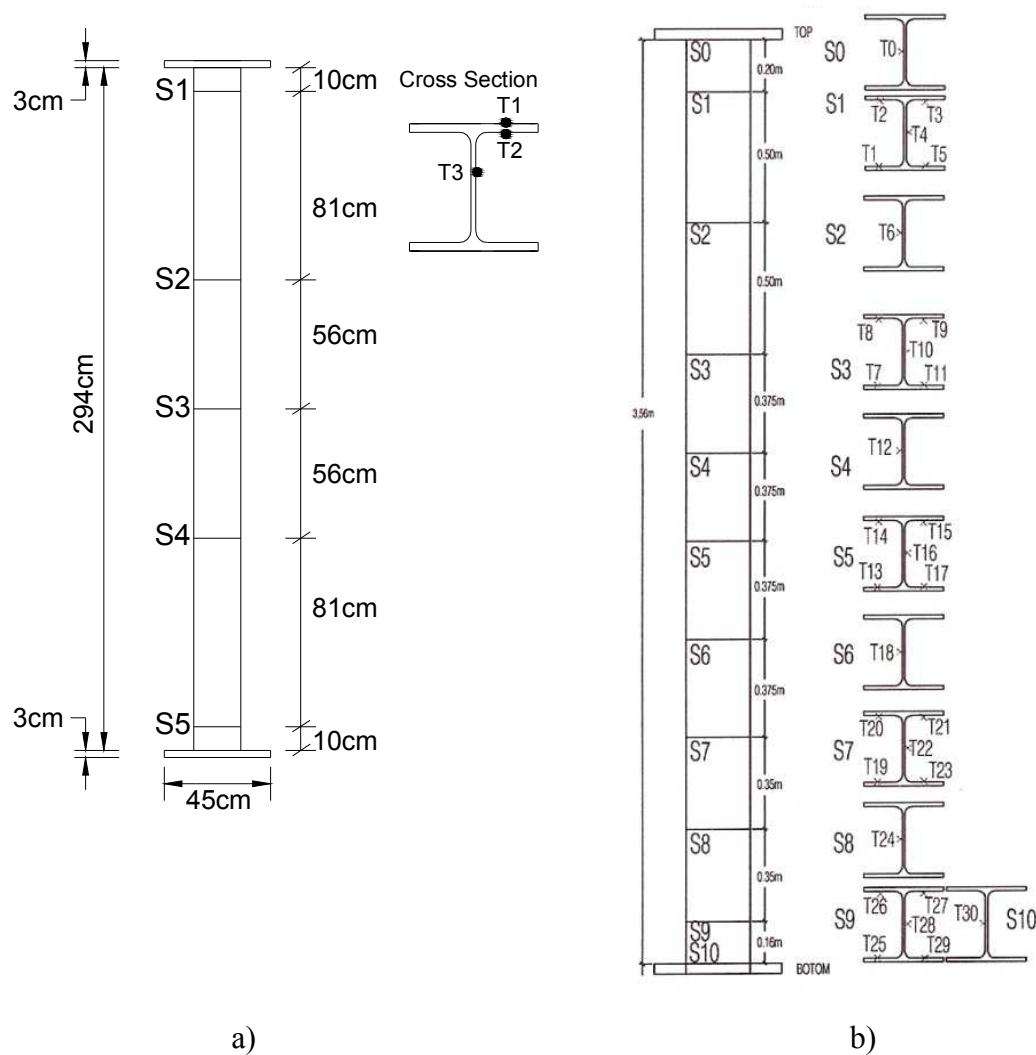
Steel specimens with position of thermocouples a) FCTUC columns b) BAM columns
